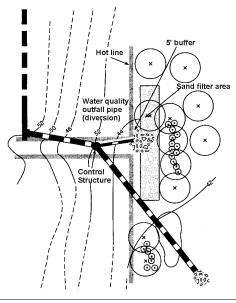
Bioretention cross-section. Runoff from storms greater than 1-year storm is bypassed through main drainage system. Runoff from small storms is diverted at the control structure (manhole). Stormwater energy is dissipated by the splash block or rip-rap. Stormwater is filtered through an open sand filter. Excess stormwater is treated in the bioretention area (CH2M Hill, 1998).
